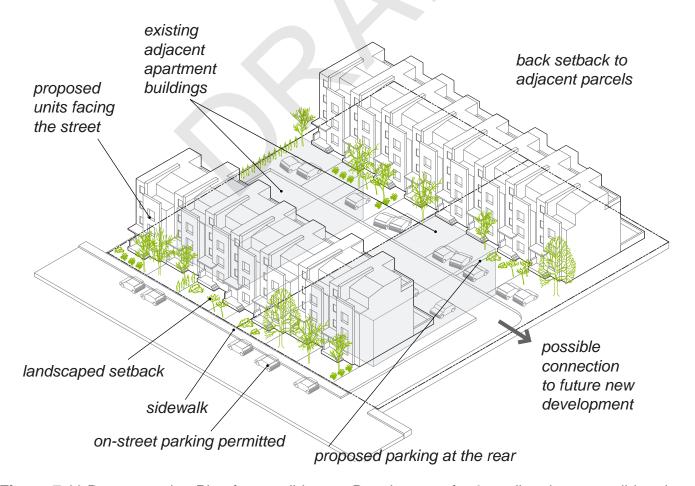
Demonstration Plan for possible new Development for 2 medium lots consolidated
